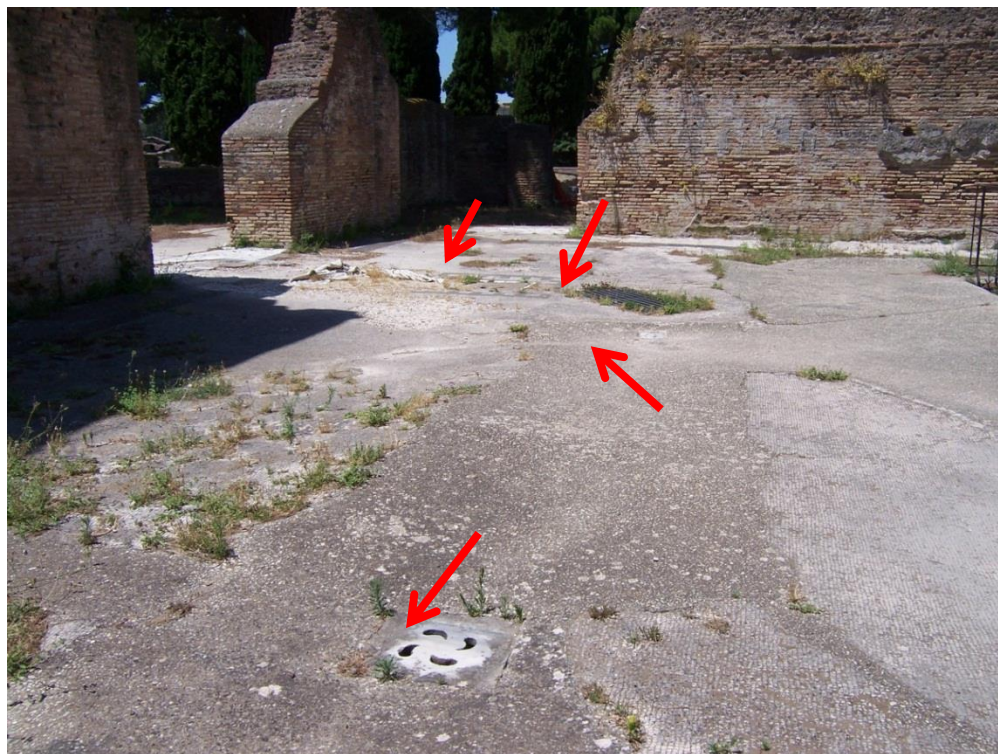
Drains D6, D7, D8, and D11 in Room 14 and Door O
